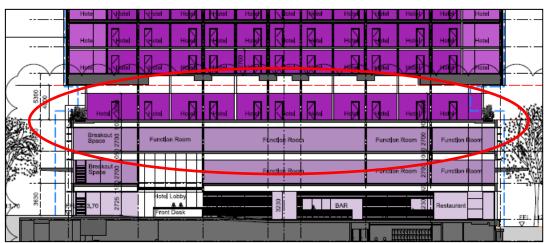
Proposed section of Levels 1 to 3 with additional hotel rooms.
